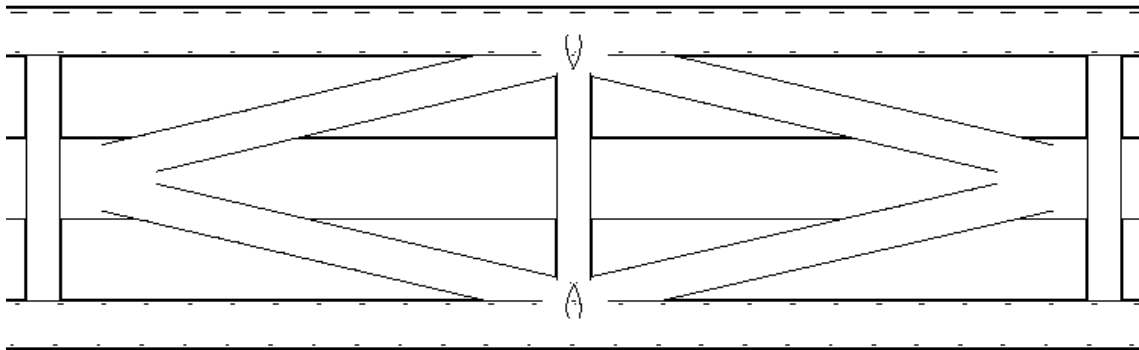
Top view of the truss arrangement, showing inclined diagonal members
